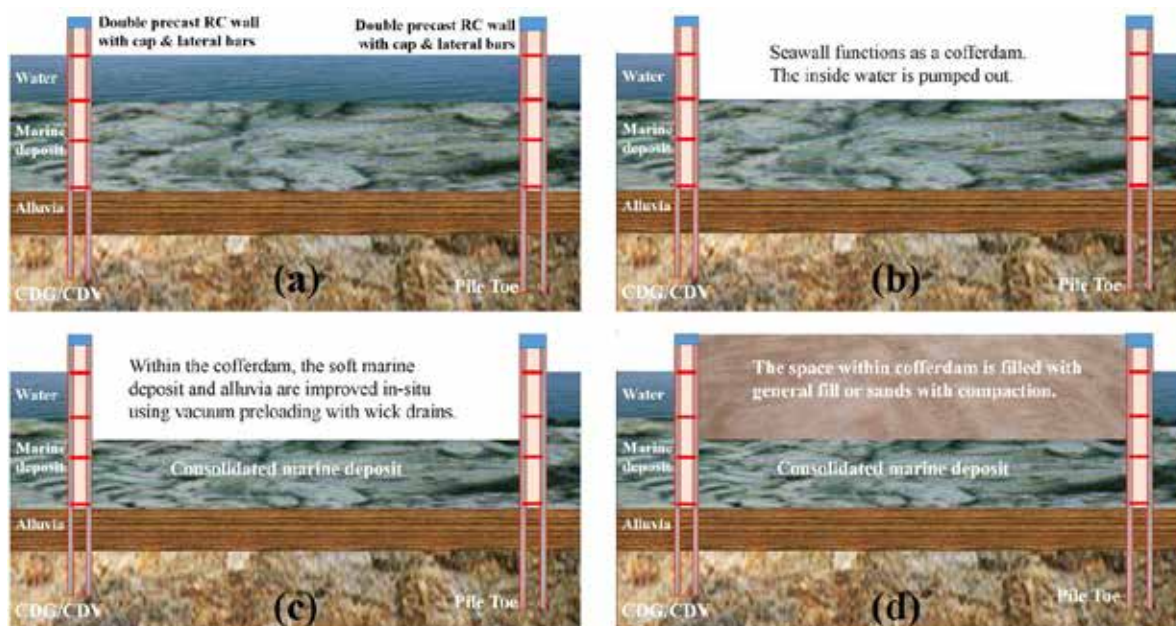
Lateral cross-sections of the conceptual seawall design and construction with connected double pile walls
